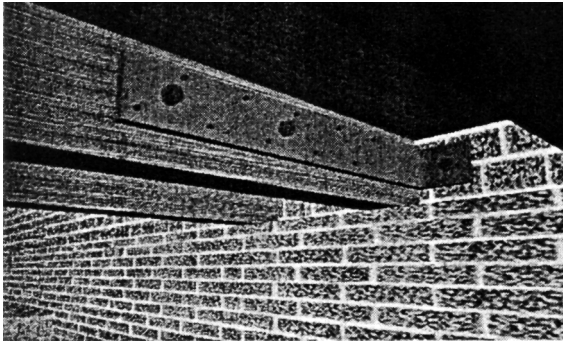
Tension Tie for Wall to Floor Retrofit
